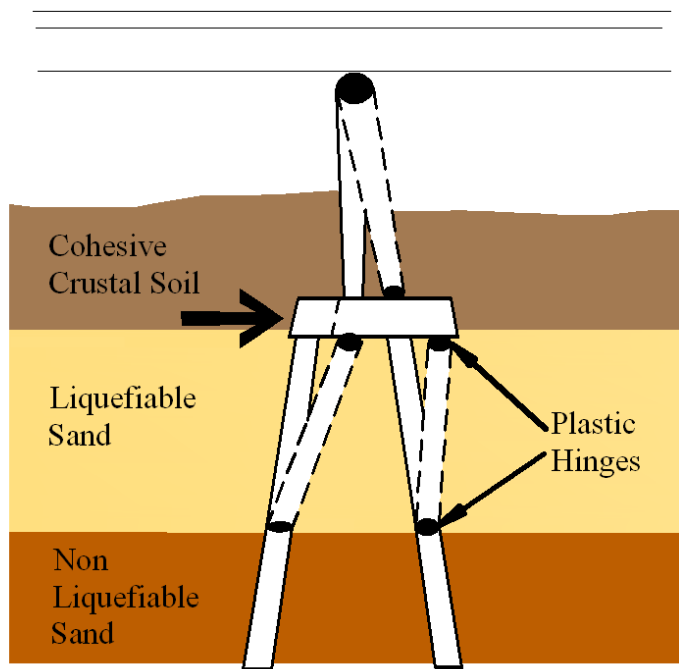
Potential Collapse Mechanism for Landing Load Bridge (Keenan, 1996)
